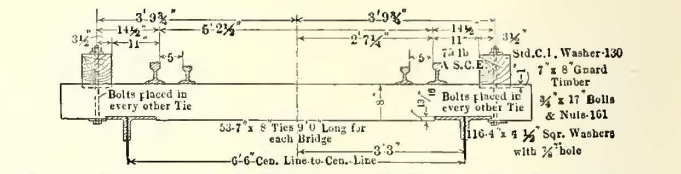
Boyertown & Pottstown Railway—Section of Roadway over Bridges at Power House and Romig's Run
